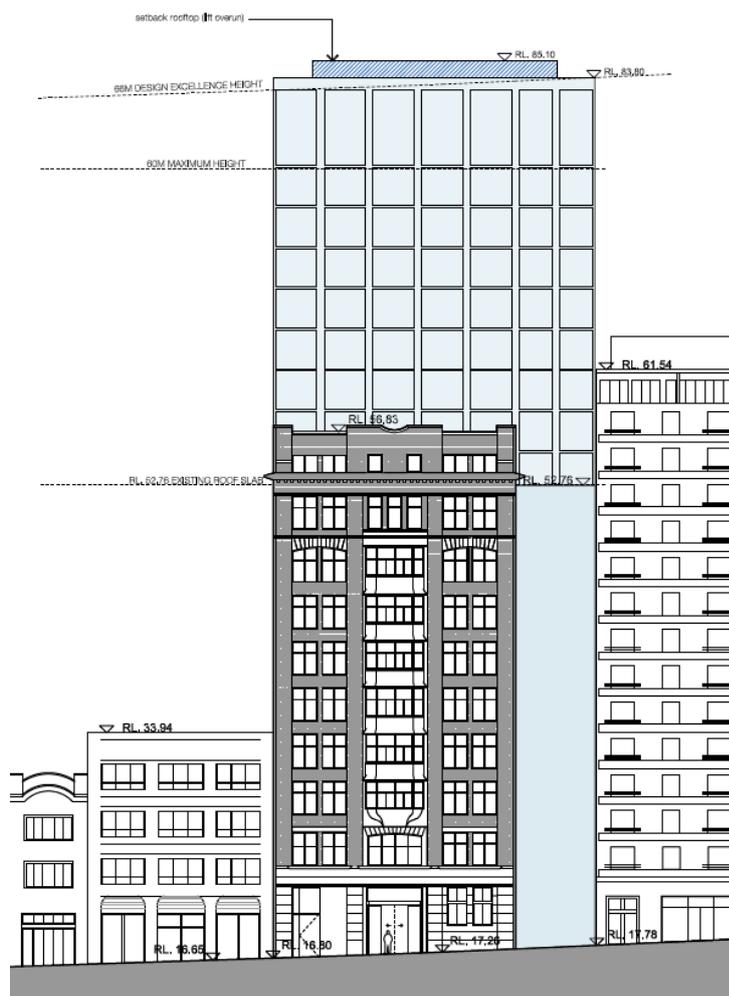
Wentworth Avenue elevation of approved Concept building envelope D/2015/920/A
